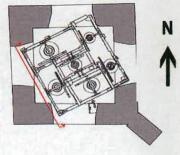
Sectional views: sheet 2 of 6 (drawing by Bill Blake/Andy Crispe)
